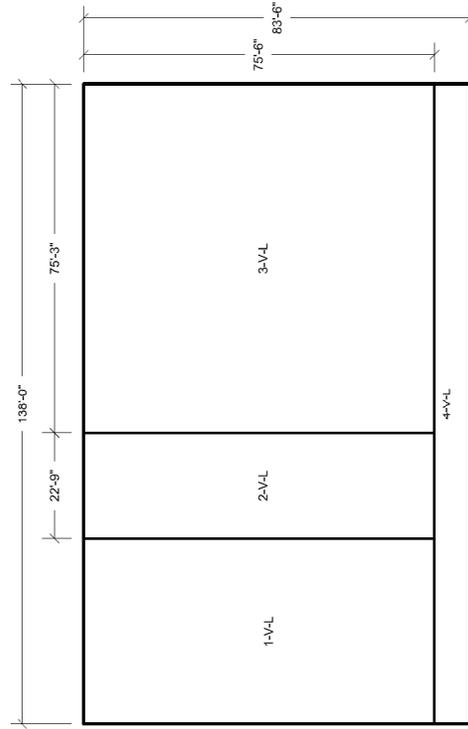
H.6-96: LHS BASIN EAST WALL LOOKING WEST
